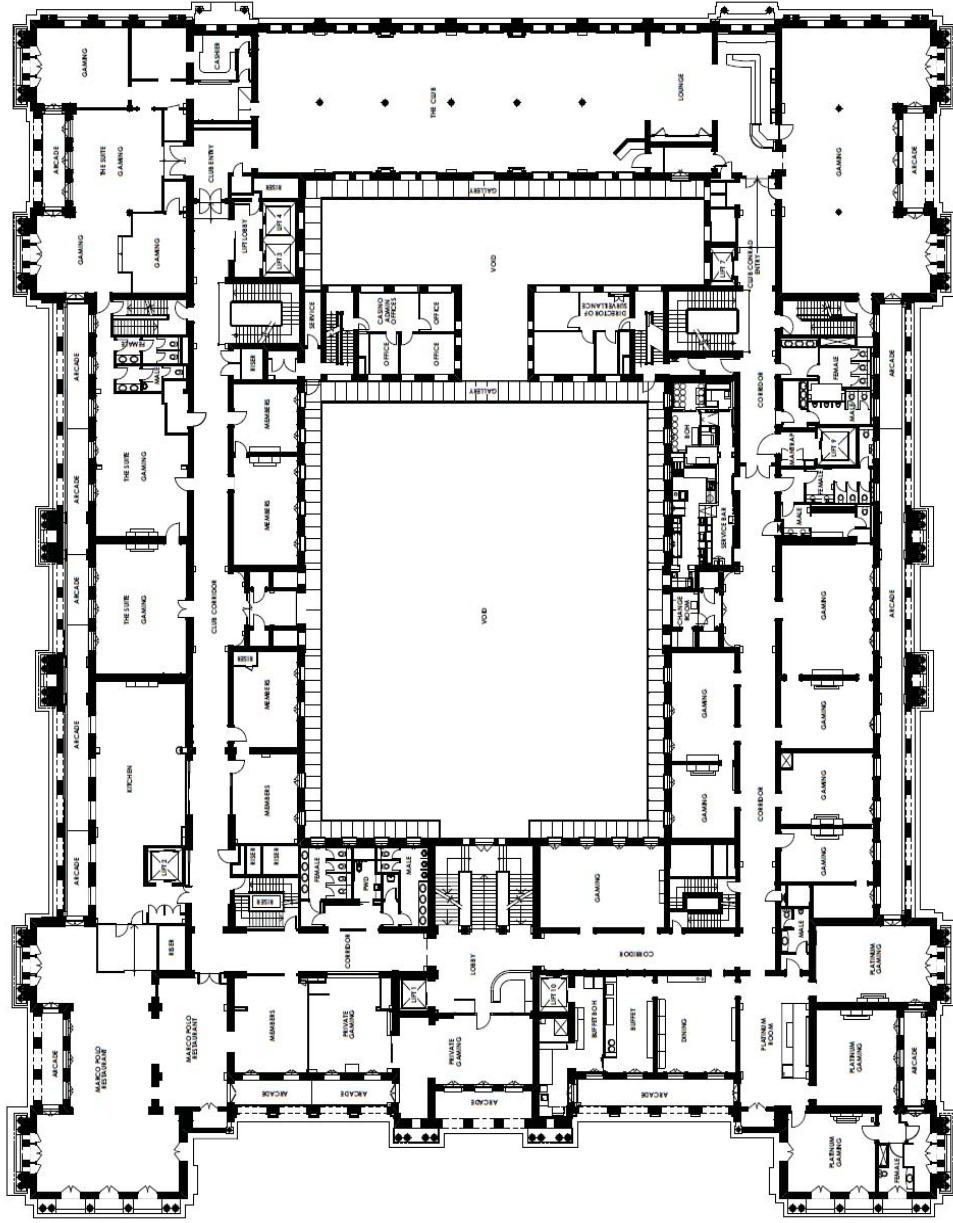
Floor Plan Level 2 (ML Design 2016)
